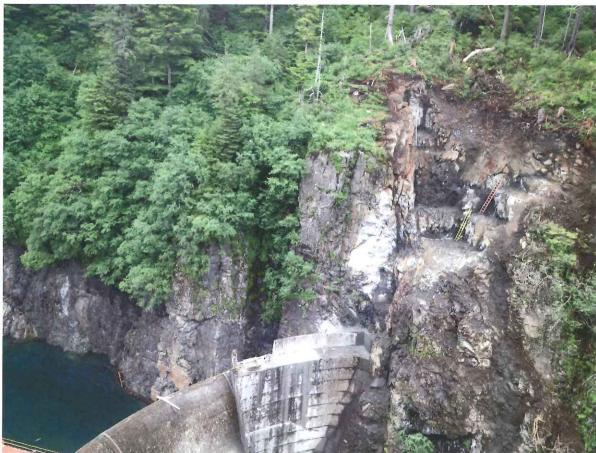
Dam and Left Abutment Area, Blue Lake Tunnelers completed the left abutment thrust block excavation. Work on the keyway began and the first concrete pour was completed on the dam.
